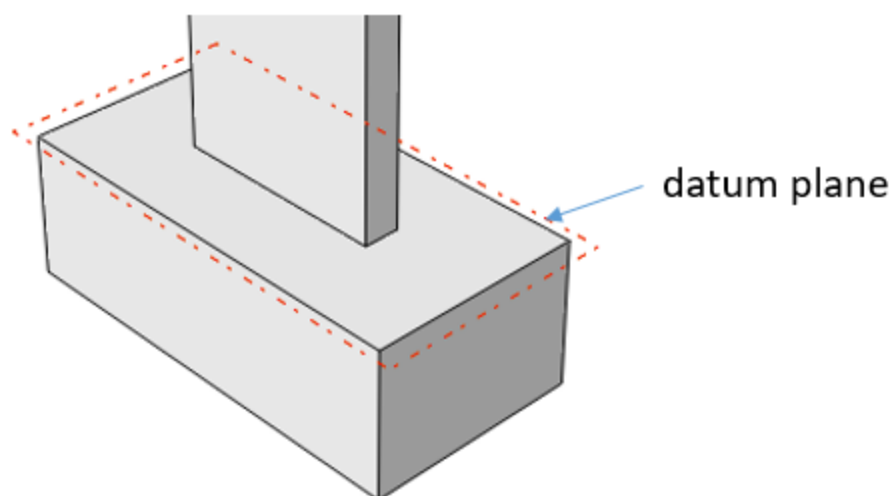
Location of Datum Plane and Cutting Level
